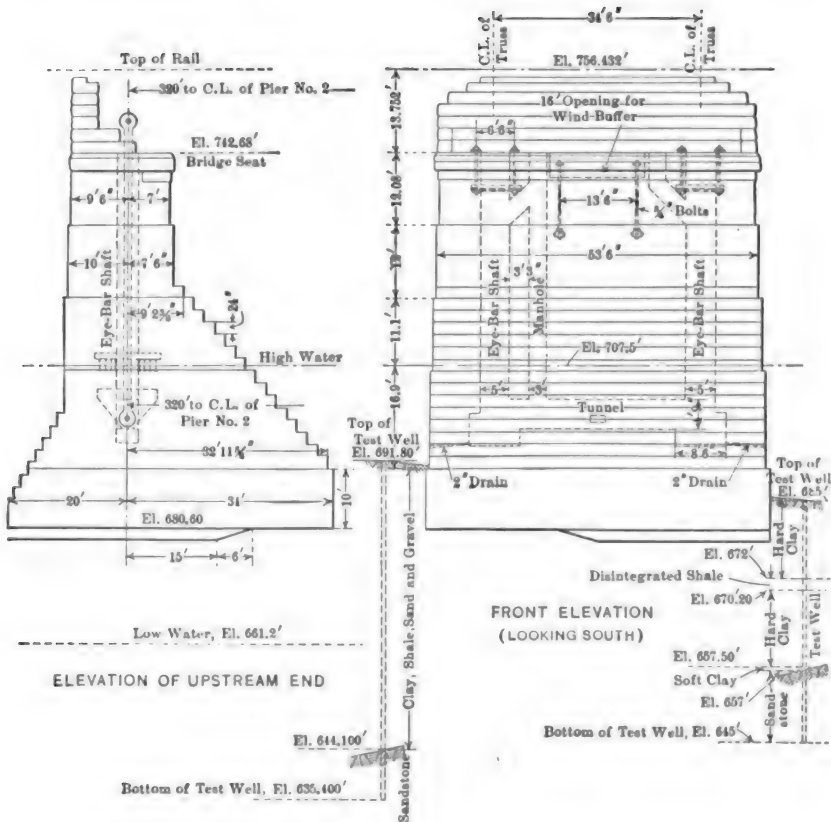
SOUTH ANCHORAGE ABUTMENT, BEAVER BRIDGE.
